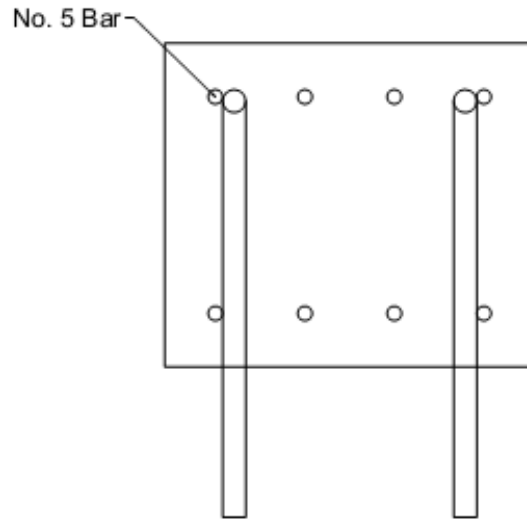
Longitudinal column reinforcement-4 No. 8 bars + 2 No. 5 bars. Transverse reinforcement not shown.
